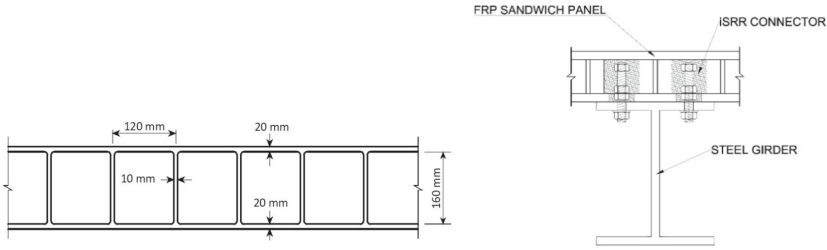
The dimensions of the FRP deck and layout of the connection to steel girder.
